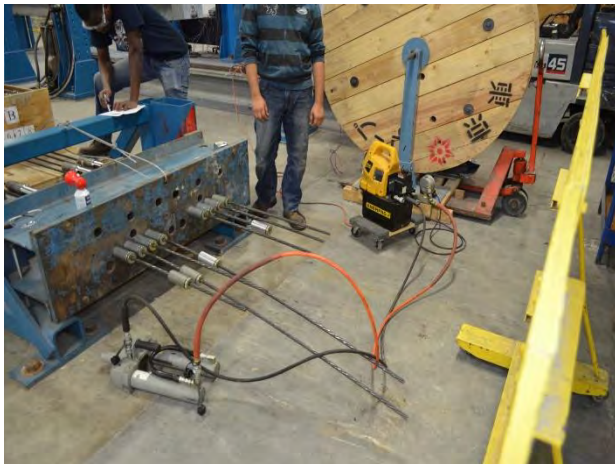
Attaching steel anchorage and applying prestressing force with a hydraulic jack
